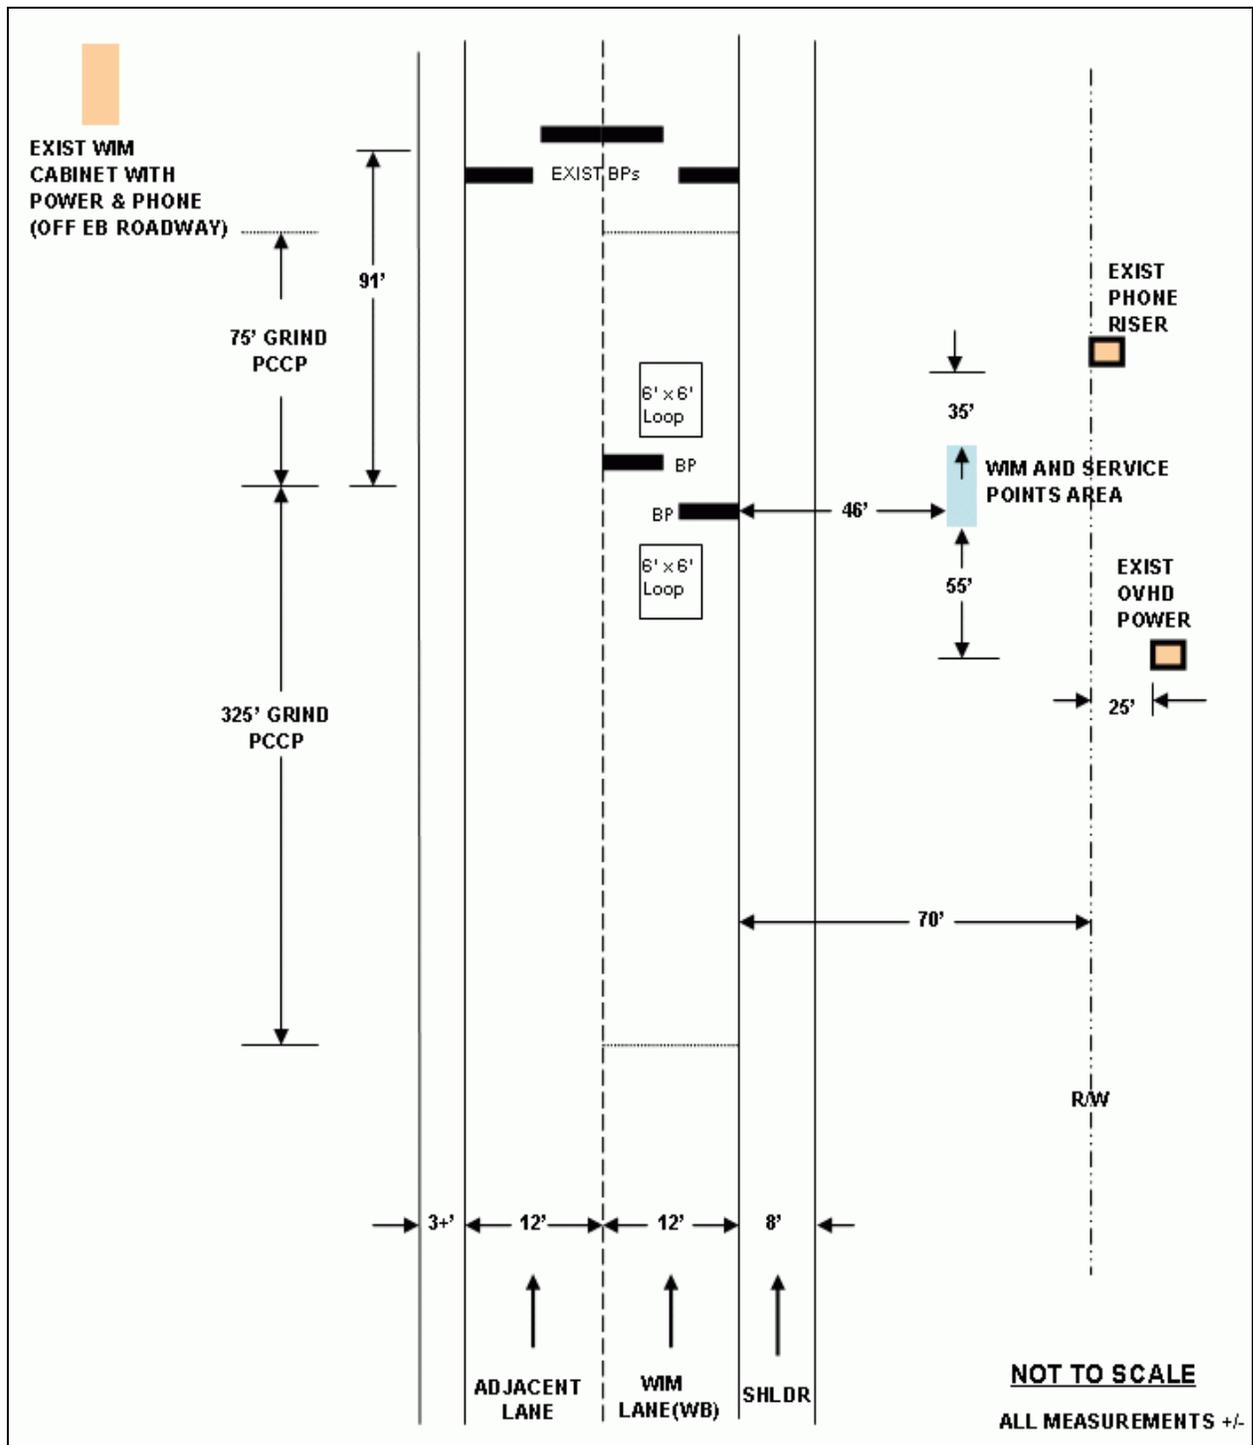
Proposed SH-29 SPS-1 WIM Site Layout
